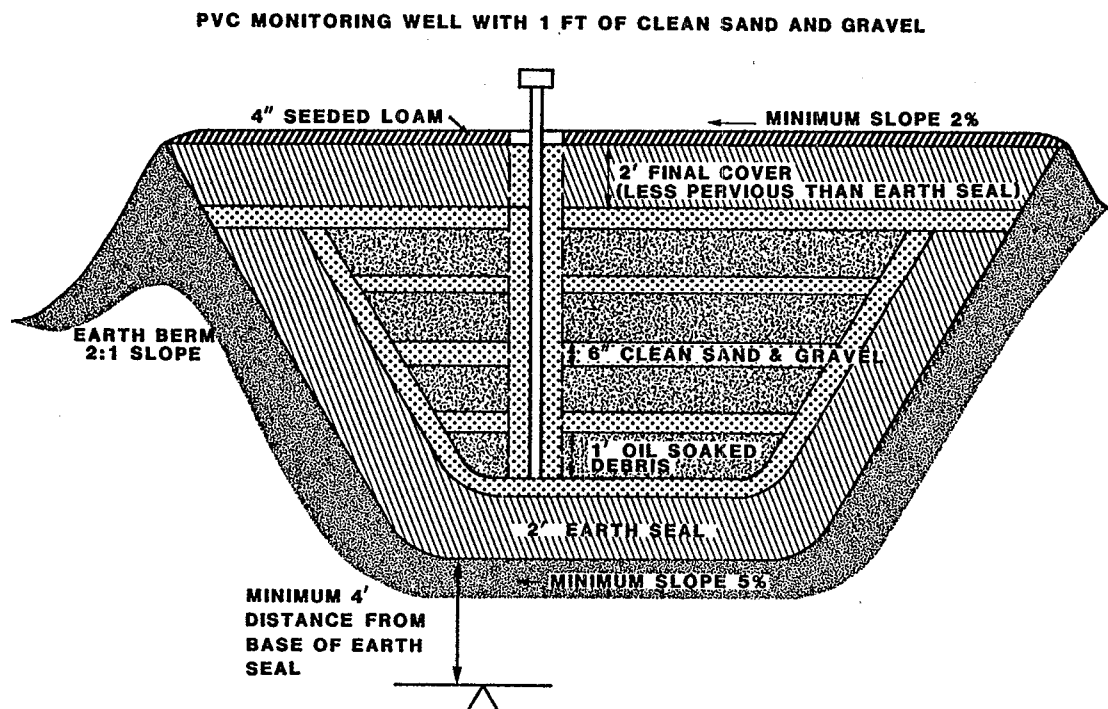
Schematic cross-section of debris burial site as designed and constructed (Jones, 1975).
